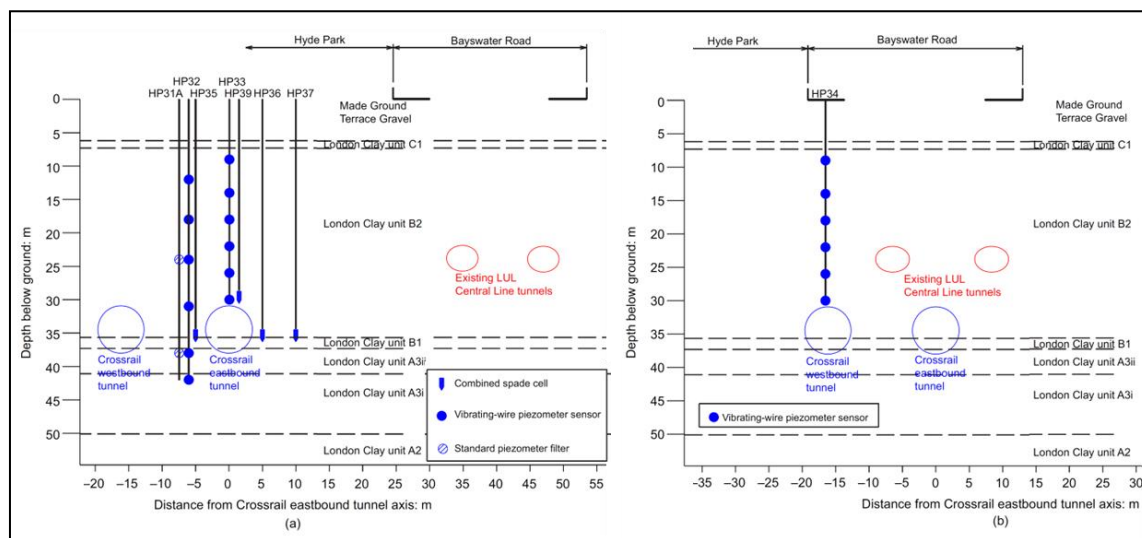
Cross-sections of piezometers installed: (a) cross-section A–A: piezometers in ‘greenfield’ ground; (b) cross-section B–B: piezometers in the vicinity of the existing LUL running tunnels (after Wan et al., 2019).
